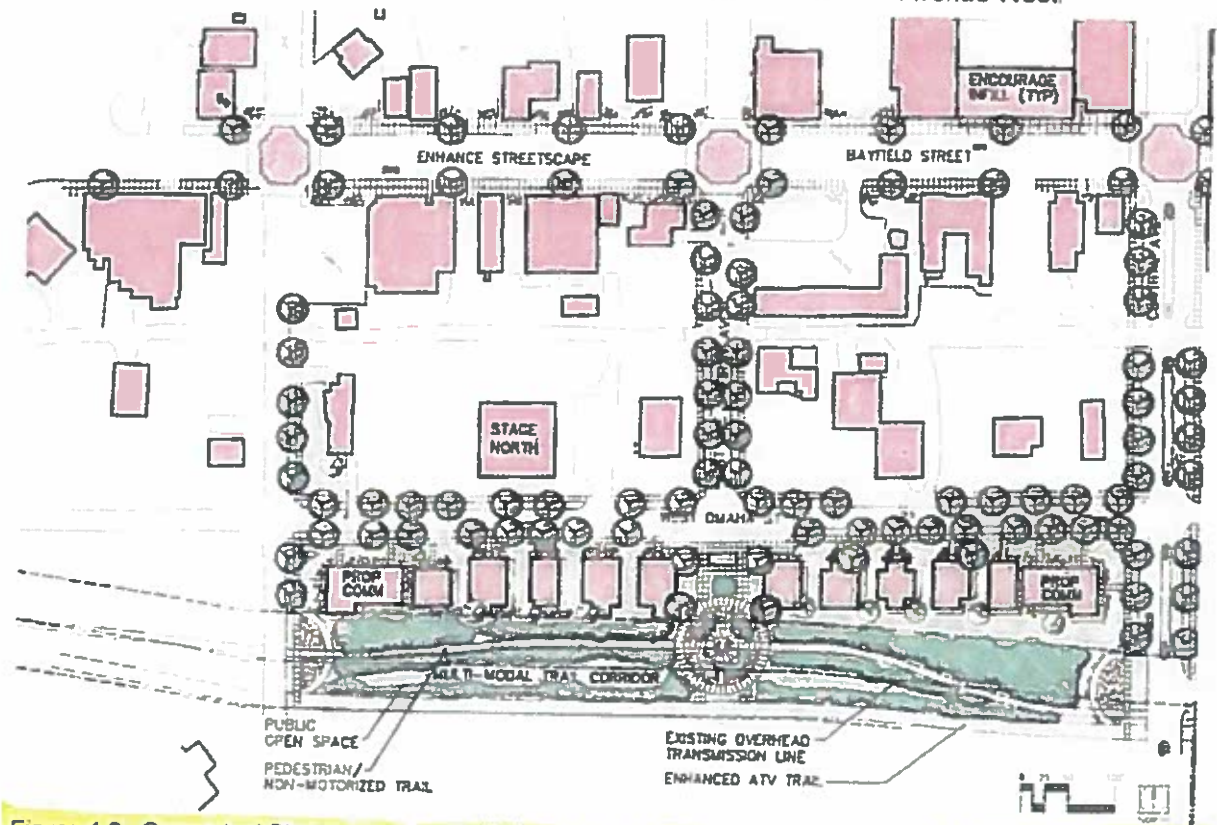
Conceptual Sketch Showing Preliminary Ideas for Redevelopment of Central Avenue from Bayfield Street to Omaha Street
